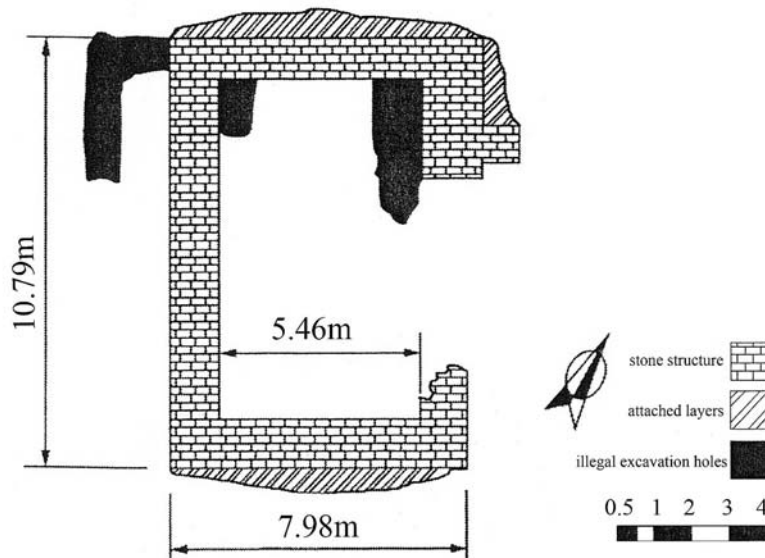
Sketch plan of Vasun-e Kahak structure.
